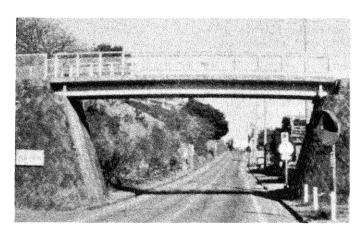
OVERCROSSING FOR PEDESTRIAN located only 20m apart from Faults near Inatori Junior Highschool at Inatori Area in Higashi-Izu Town, which survived safely against Earthquake with minor cracks at Parapets.
